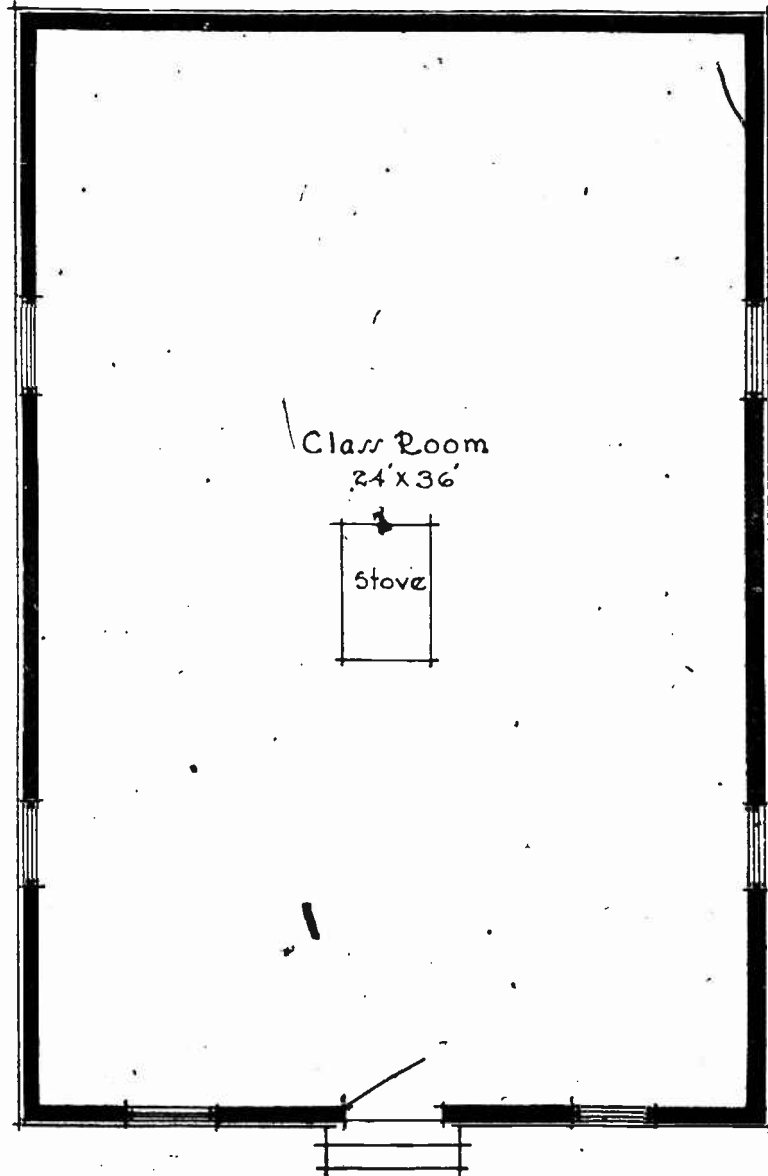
Floor plan of a typical old school building (see also p. 116).
